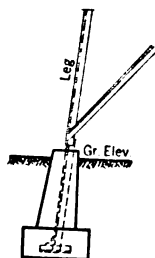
SHOWING CONCRETE FOOTING WITH LEG ANGLE ATTACHED TO STUB ANGLE WHICH EXTENDS INTO THE CONCRETE
